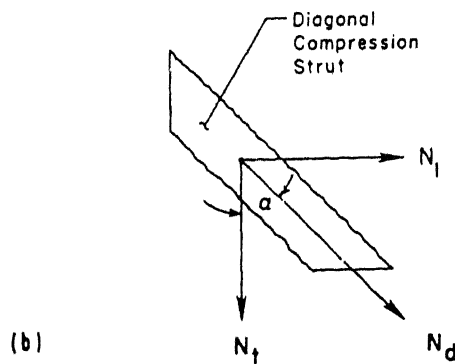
Truss Model [Alexander and Simmonds, 1987]
